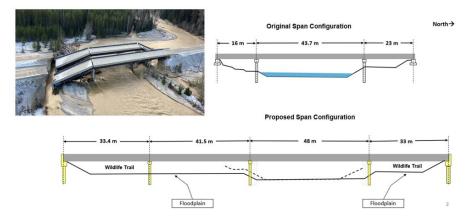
Original and New Configuration at Bottletop Bridge on Highway 5
